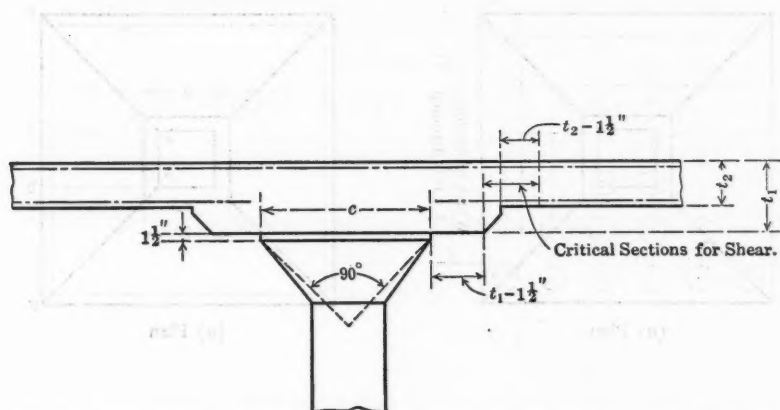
TYPICAL COLUMN CAPITAL AND SECTIONS OF FLAT SLAB WITH DROPPED PANEL.
